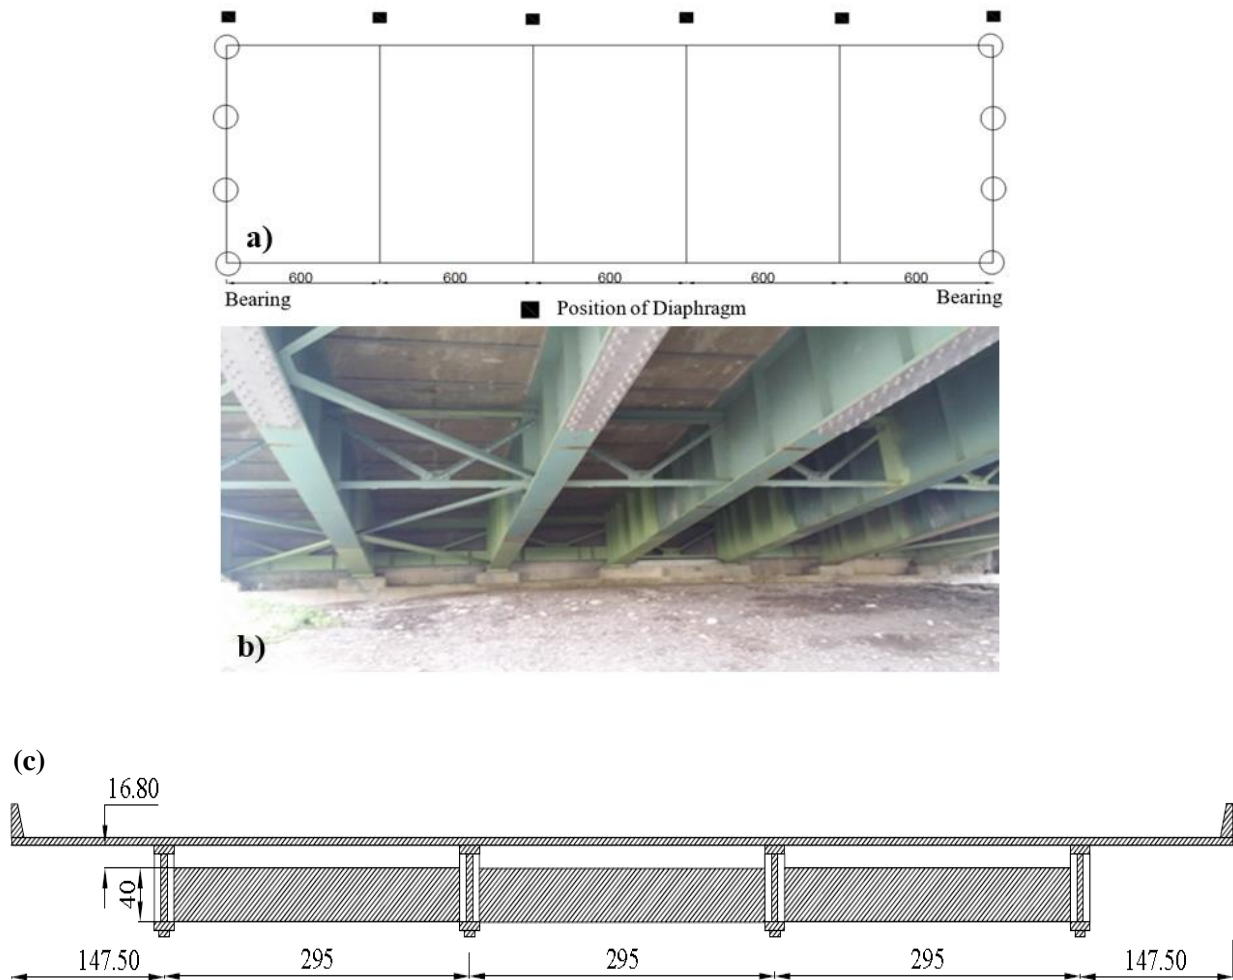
Diaphragms of the model bridge: (a) Layout of diaphragms along span; (b) Cross frame diaphragms of Winnipeg Bridge 1; (c) Elevation of diaphragm, (all dimensions are in mm)
